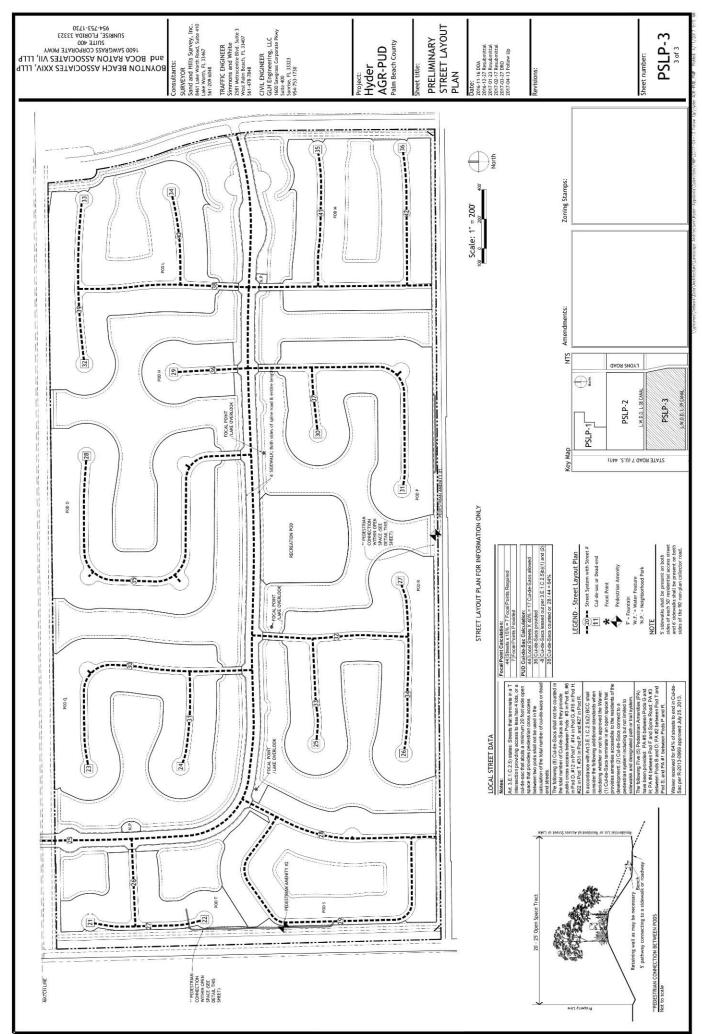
Preliminary Street Layout Plan dated April 13, 2017 (Sheet 3 of 3)
